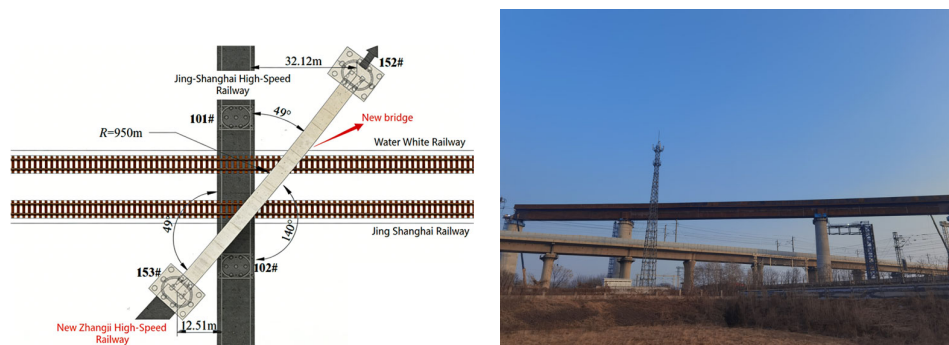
Plan view of the relative positions of the new bridge and the existing HSR line and the site view.
